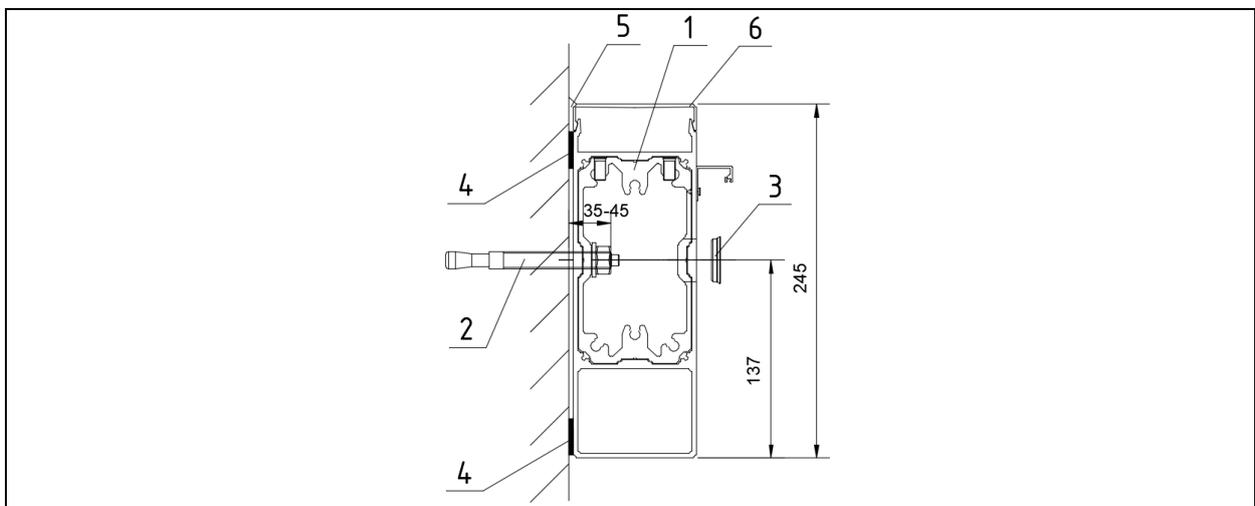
Through fixing (1- wall fixing reinforcement connector, 2- M12 anchor (not supplied by SELT), 3- painted cap, 4- EPDM tape strip, 5- seal with silicone, 6- beam revision).
